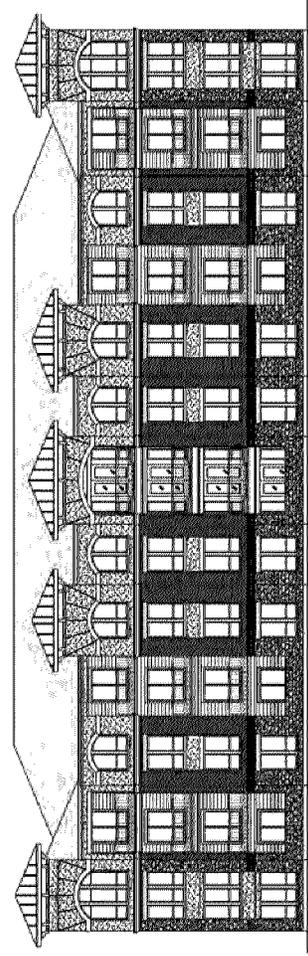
BUILDING ELEVATIONS ALONG STADIUM DRIVE
